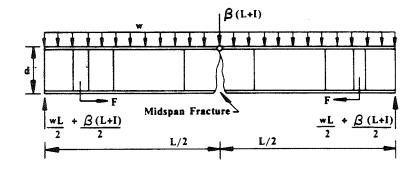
Elevation View of Fractured Girder as a Free Body
